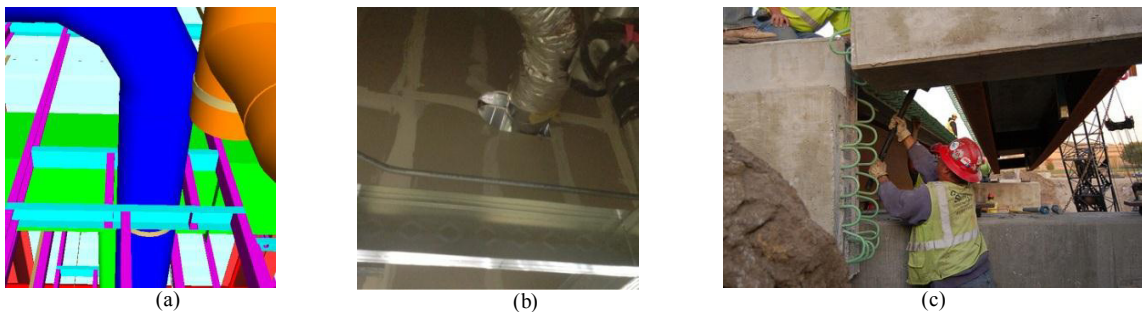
Misalignments between prefabricated structural components and building systems (a) as-designed; (b) as-built; (c) bridge misalignment
